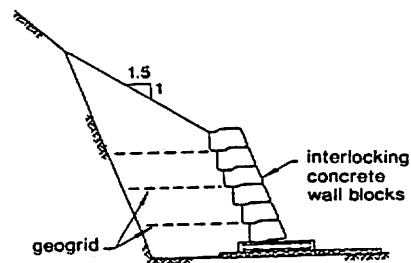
Tronderblock precast concrete facing (Jones 1988, 1991, Knutson, 1990)
